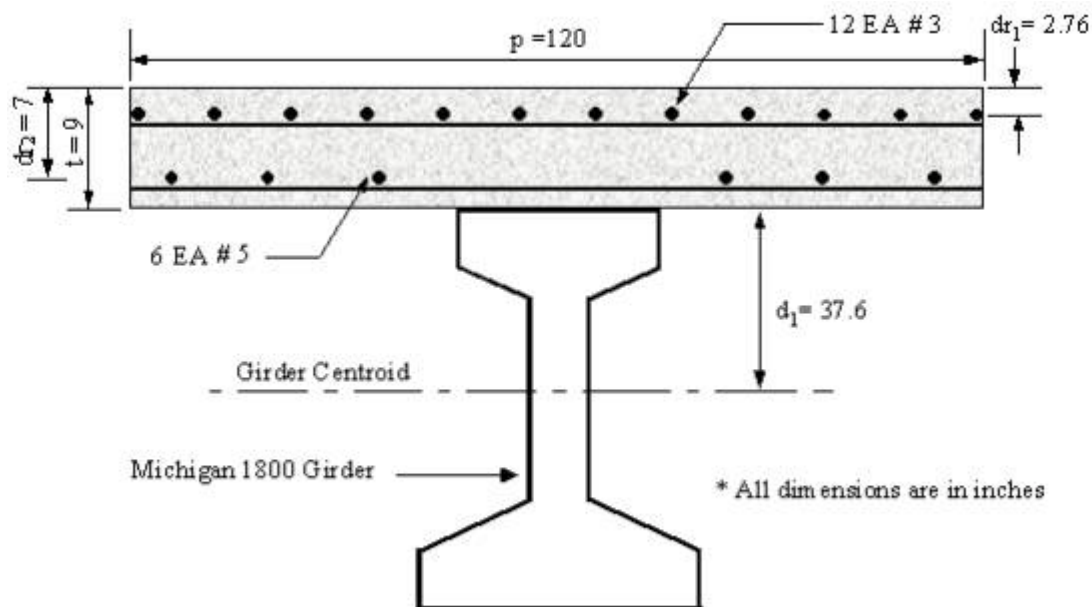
Geometry and reinforcement arrangement of the deck section supported on PCI girders
